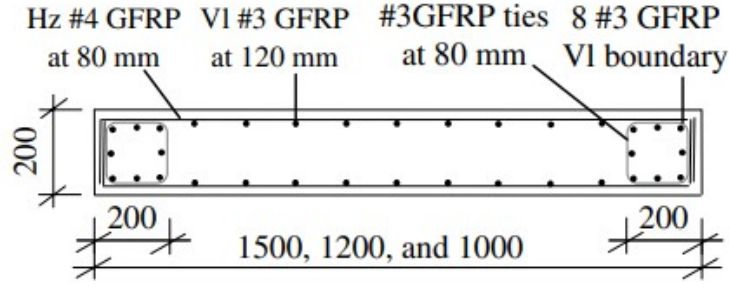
Cross section and reinforcement detailing of walls G10,G12 and G15 [13]
